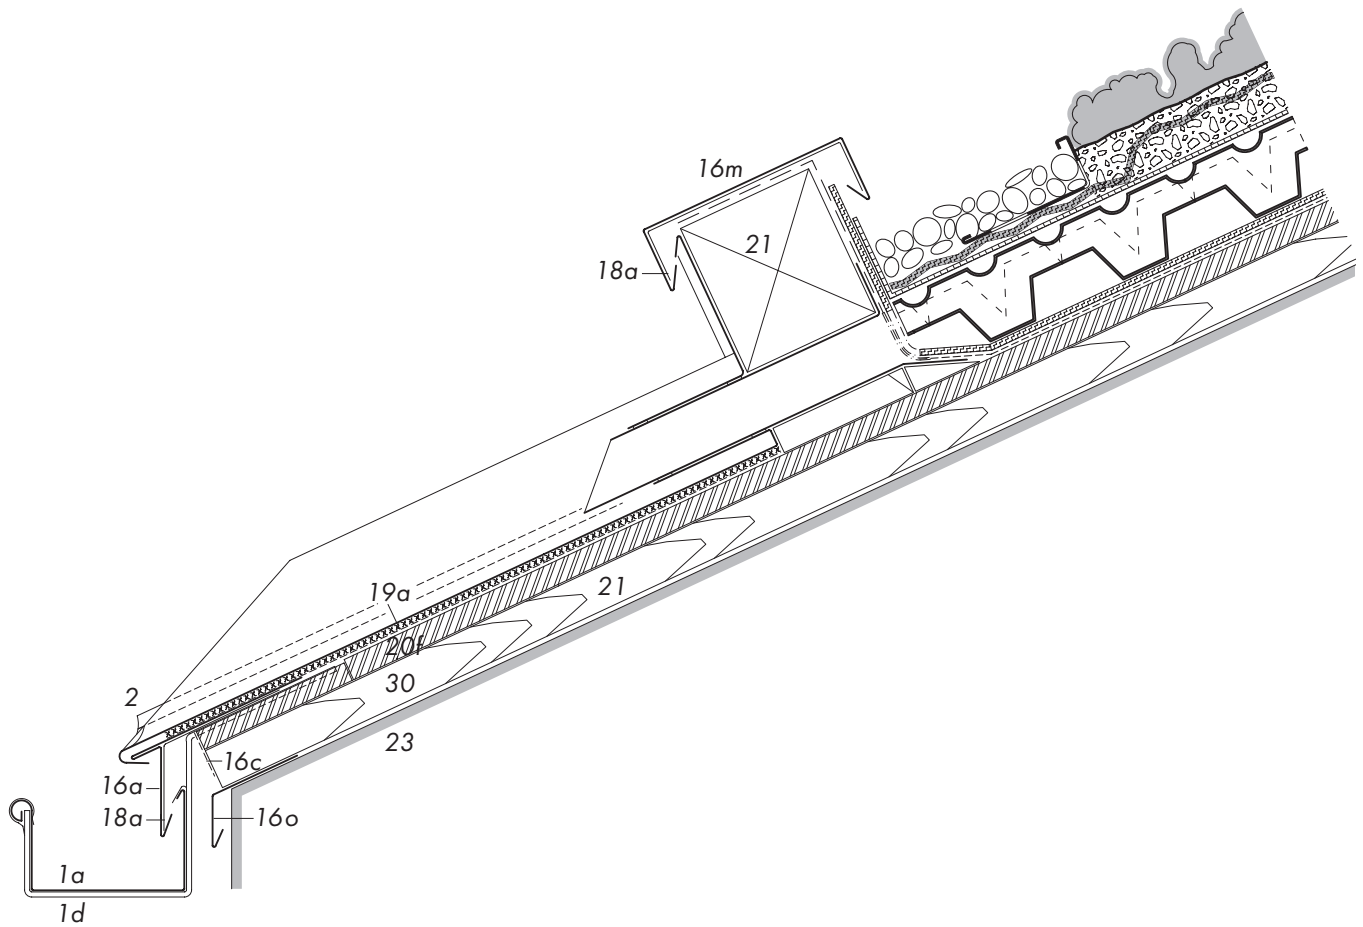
Detail of eaves – Eaves side connection to a green roof
